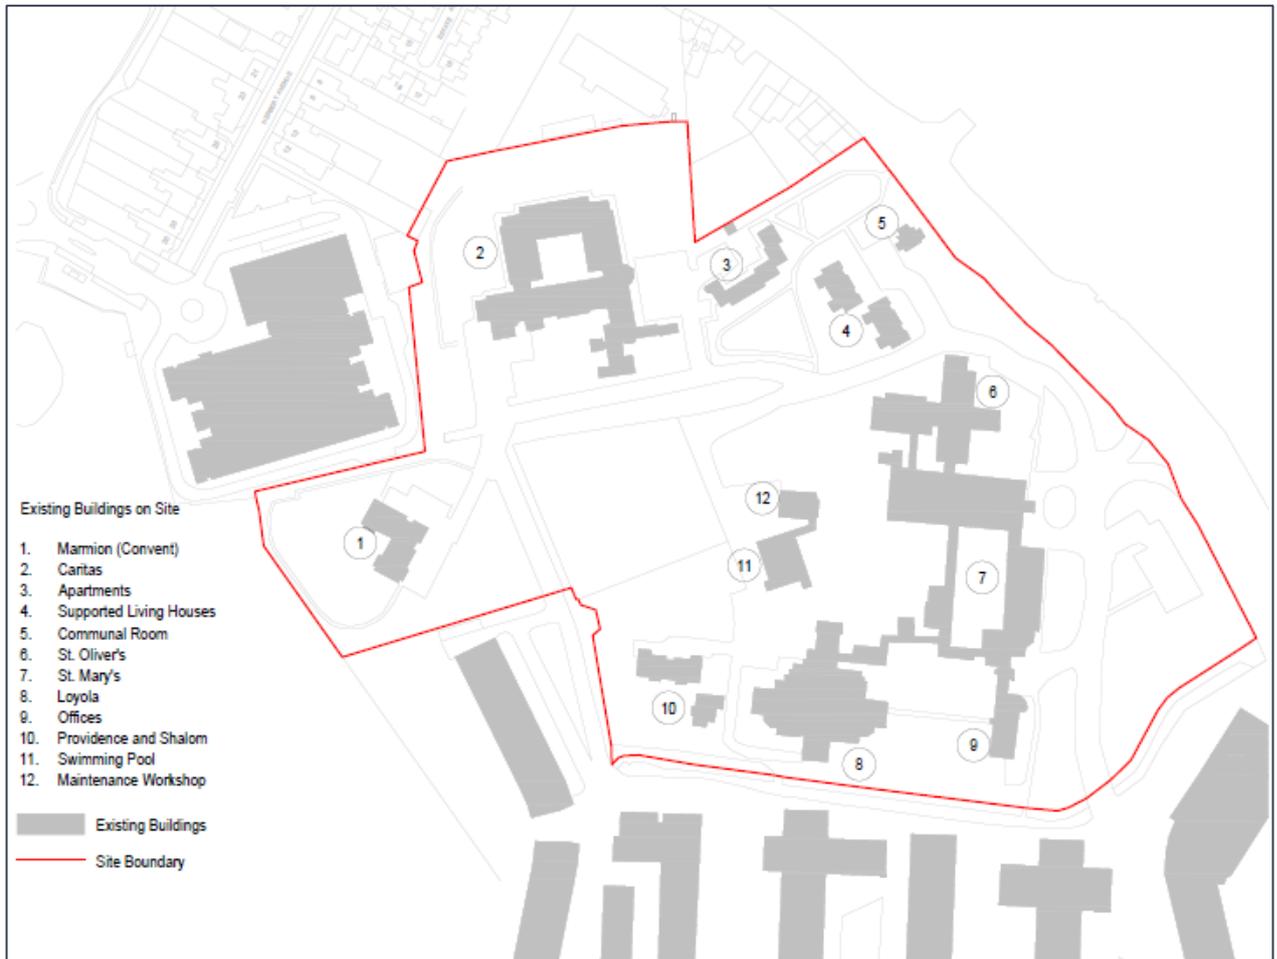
Existing Building on site. Source: O'Connell Mahon Architects.
